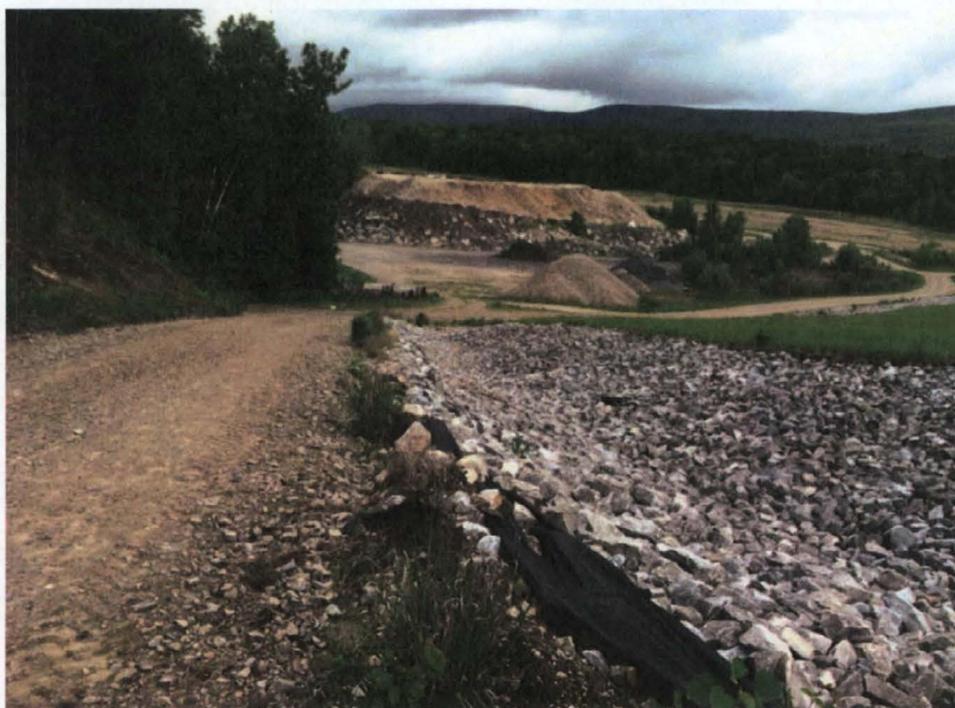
Perimeter ditch at northwest corner of landfill from access road to gravel pit
